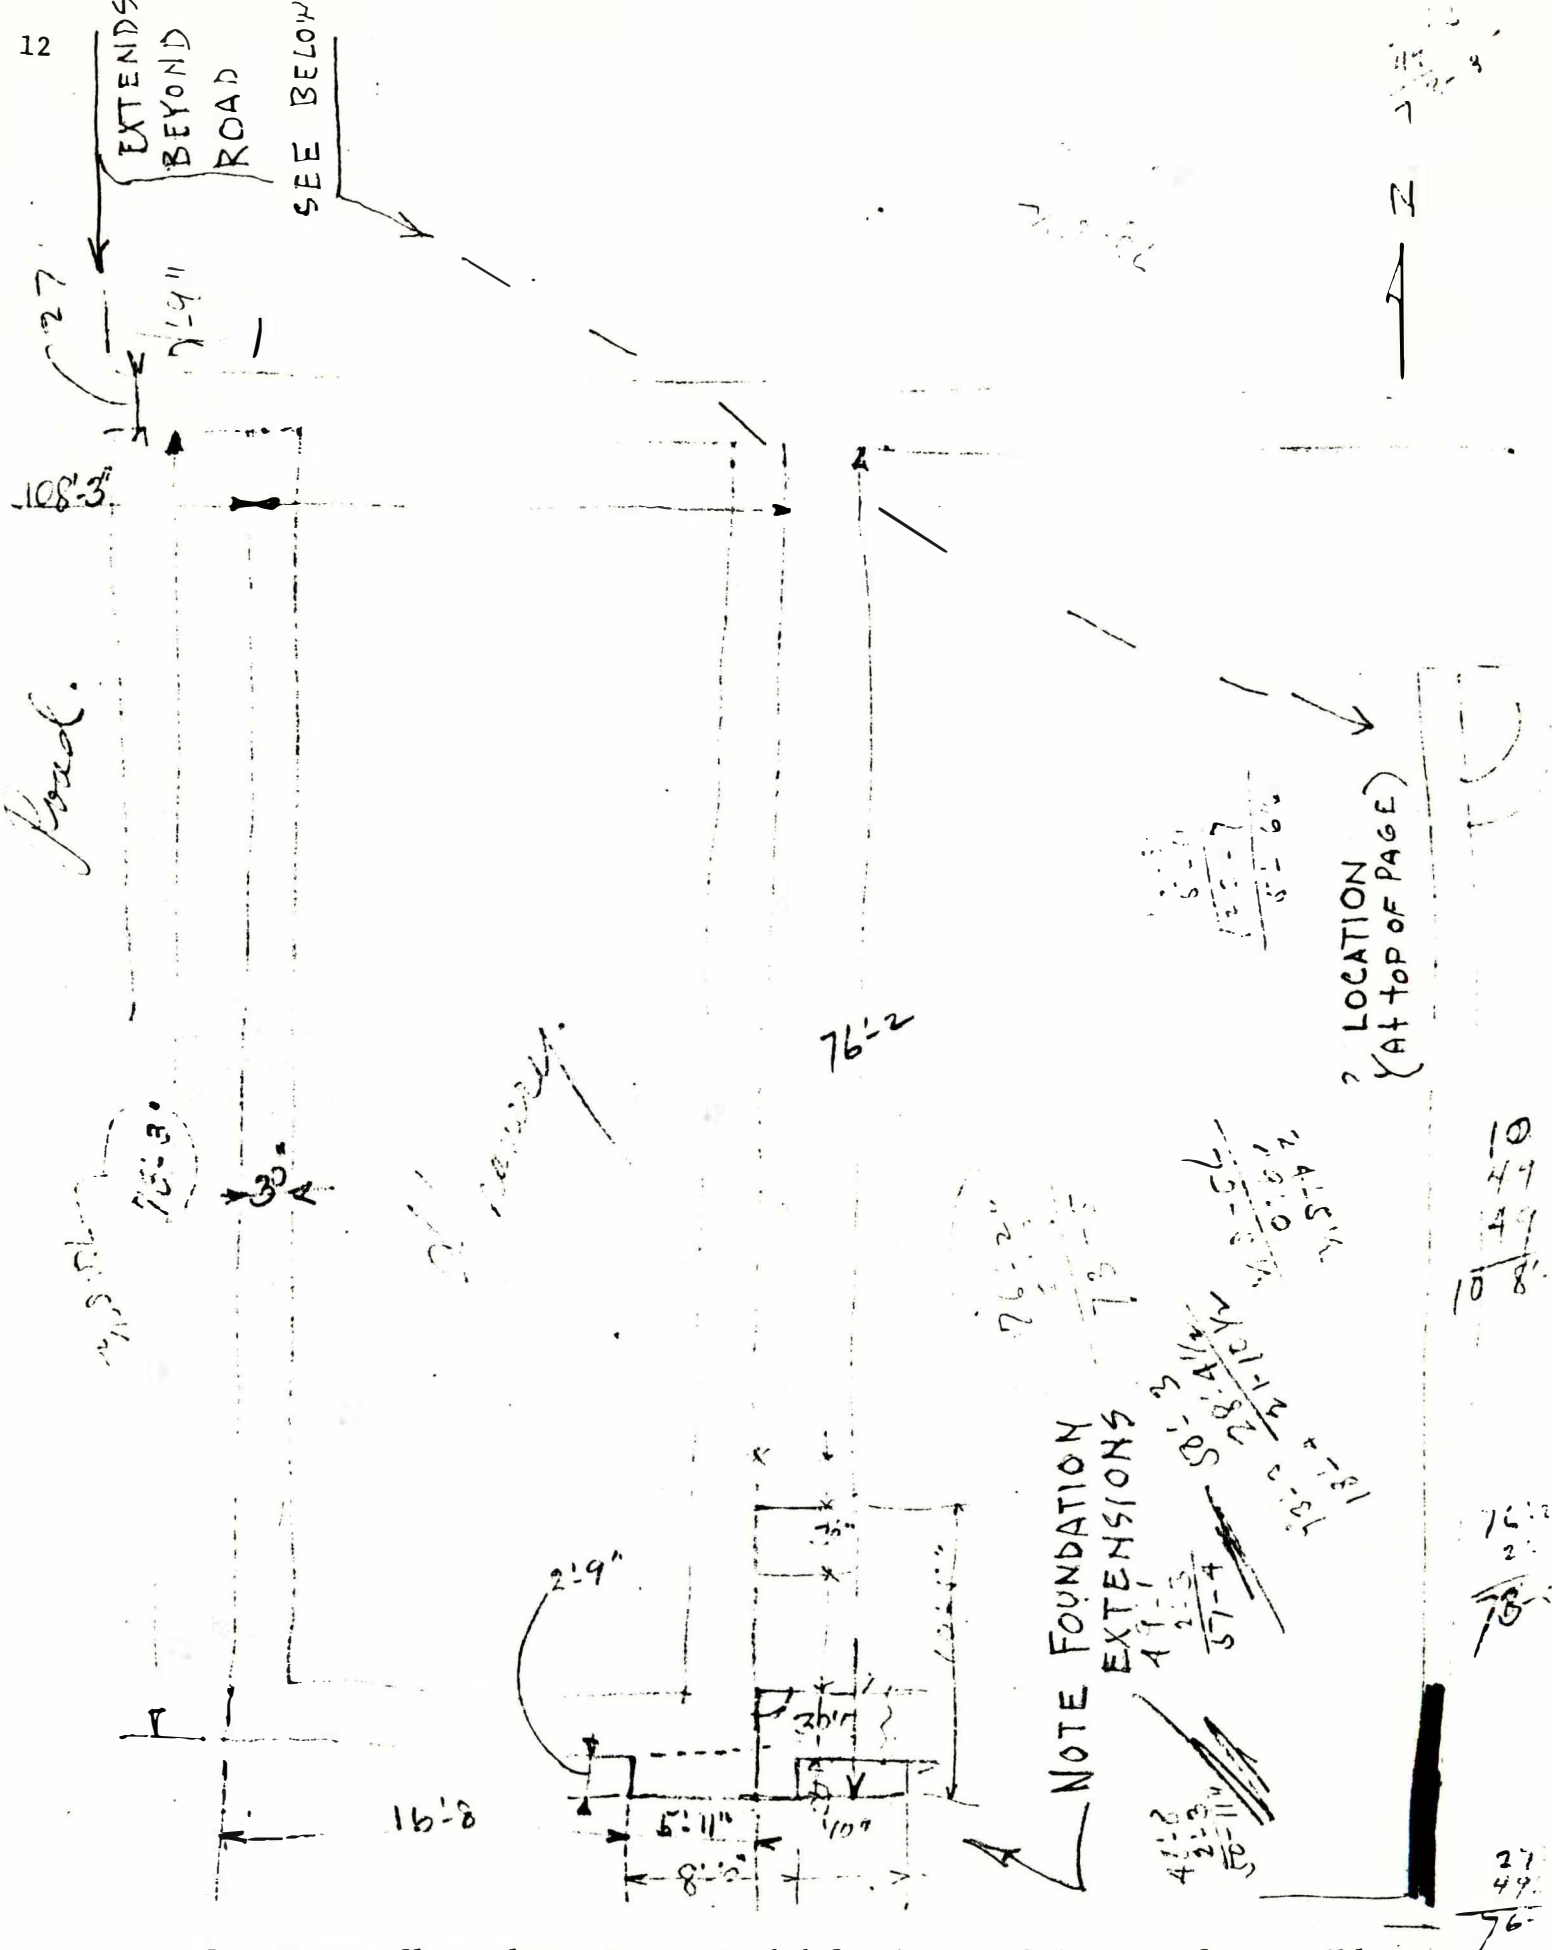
Granary floor plan. Note extended footings at S-E corner for possible bastion.
